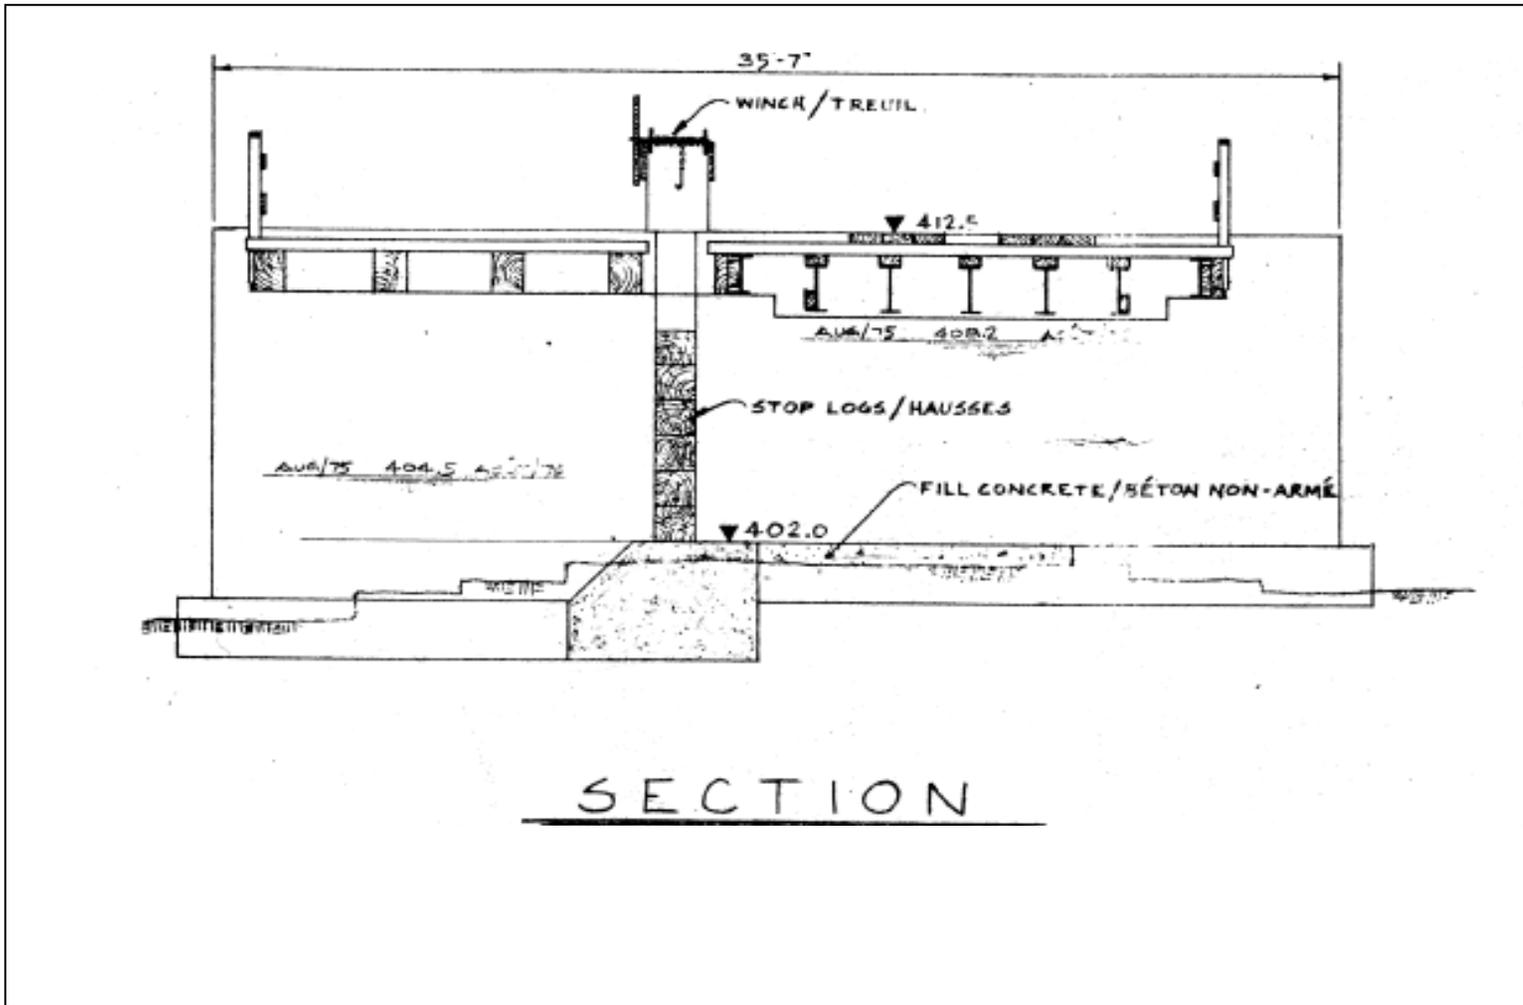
Typical Drawing of Narrows Dam by J. D. Lee Engineering Limited (1975)
